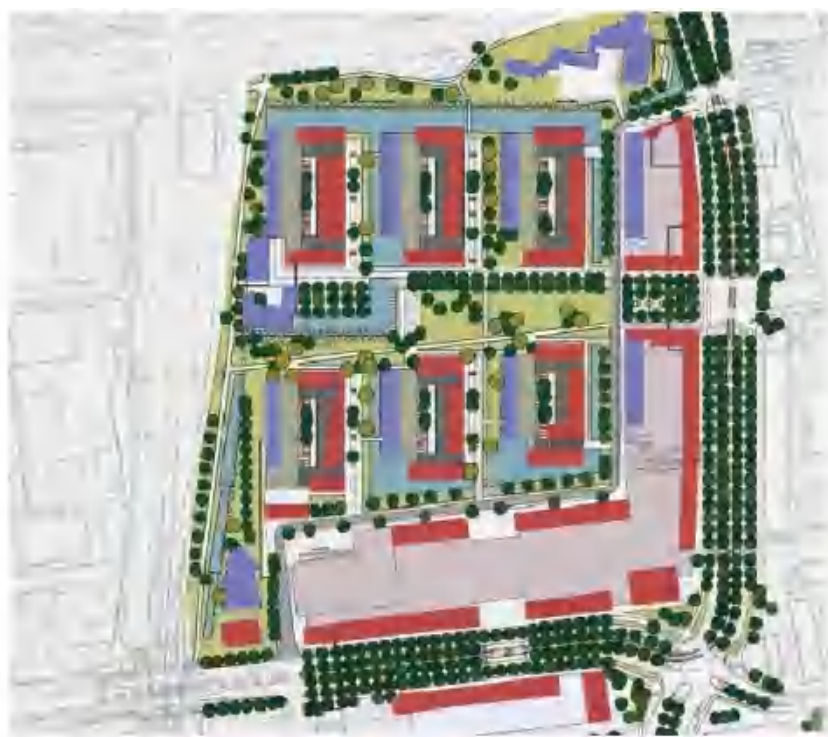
Poptahof Plan (Source:drawn by author)
